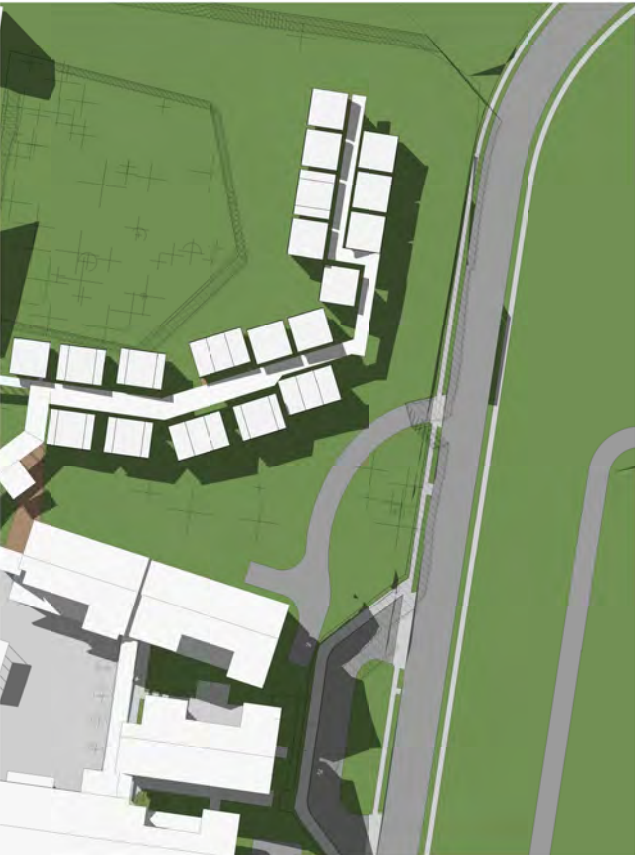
Site plan extract depicting the existing shadows at 3 pm
